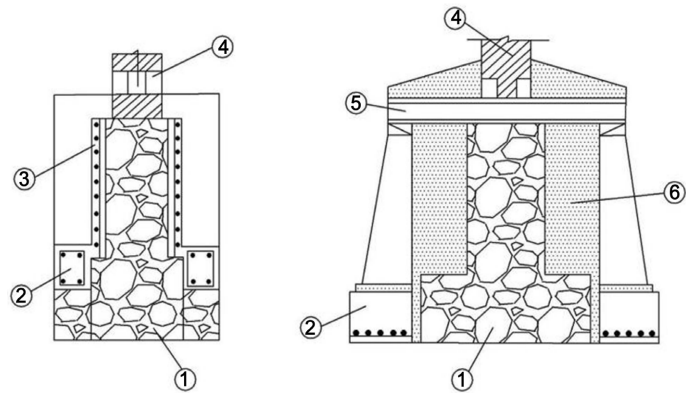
Proposal for reinforcement of brick (stone) foundation. In Figure 2: 1—foundation; 2—concrete beams; 3—reinforced reinforced concrete; 4—building wall; 5—horizontal steel beams; 6—full concrete block.
